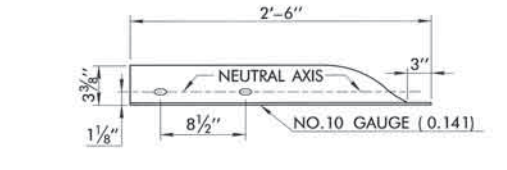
DETAIL 'A' ANCHOR DEVICE (5/8" BOLT)
